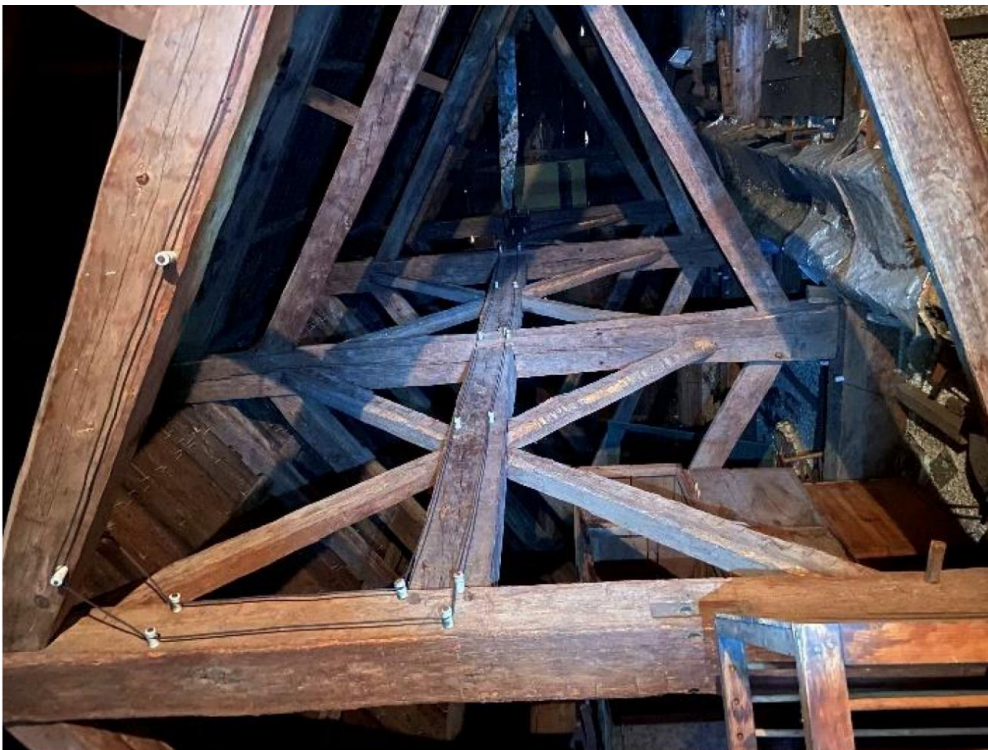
Roof structure of the Meetinghouse (rotated – left is top).
